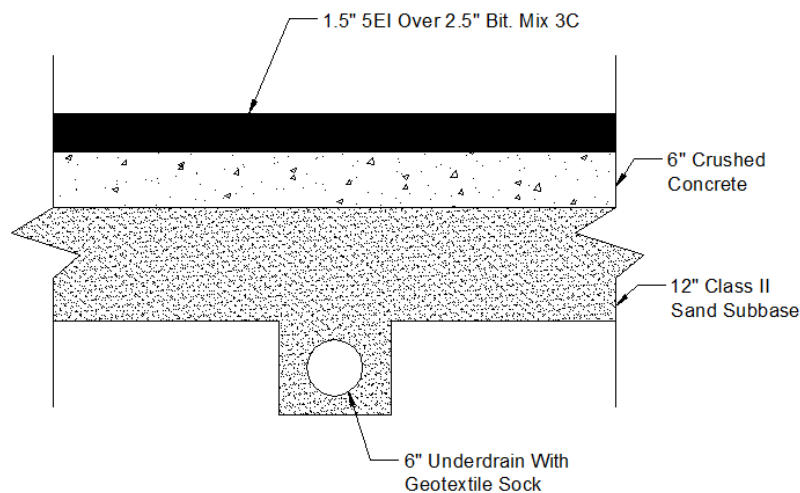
Pavement Detail (Roadway & Parking Lots)
